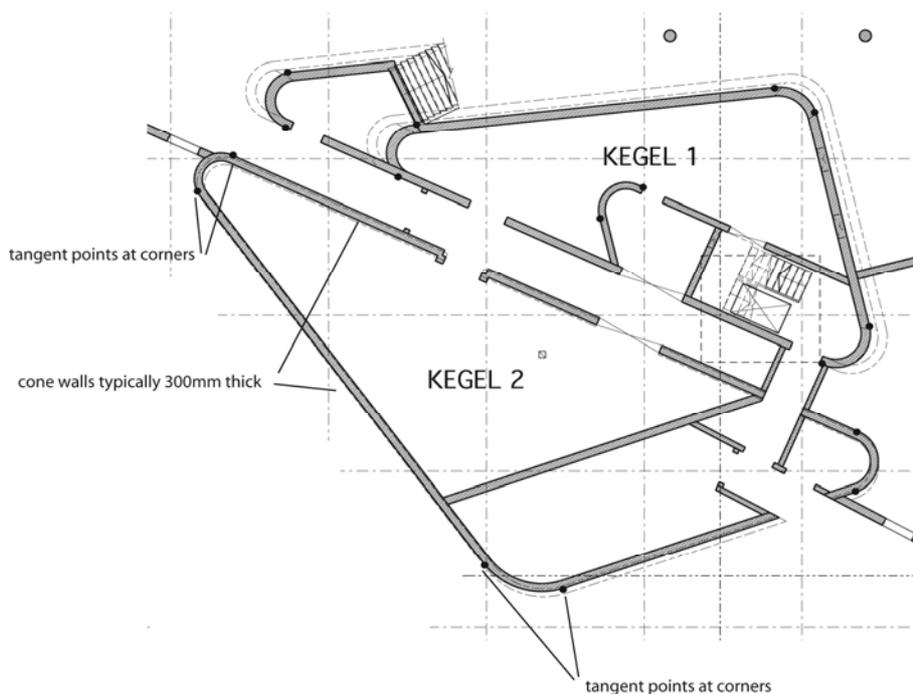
setting out tangent points of cone 1 and 2 in plan view at basement level
